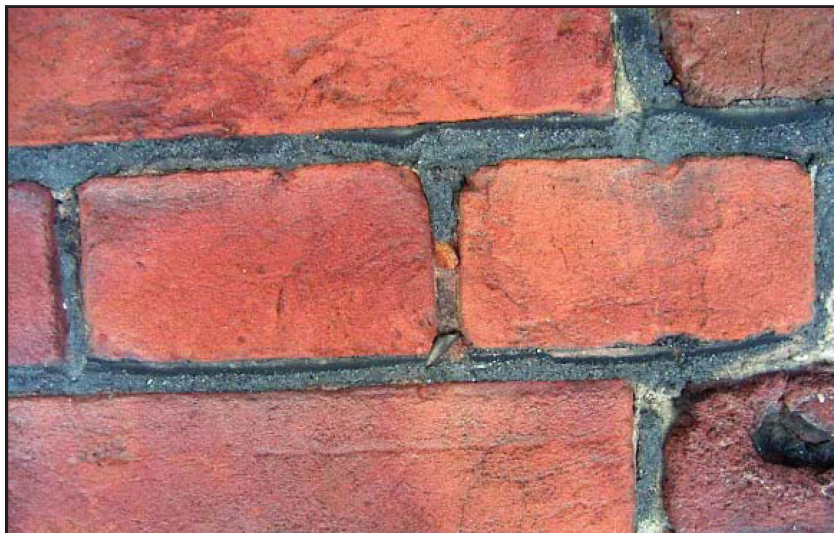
North elevation, first floor level, external view, red paint evident in area of 1888-1924 infill (centre of picture)
